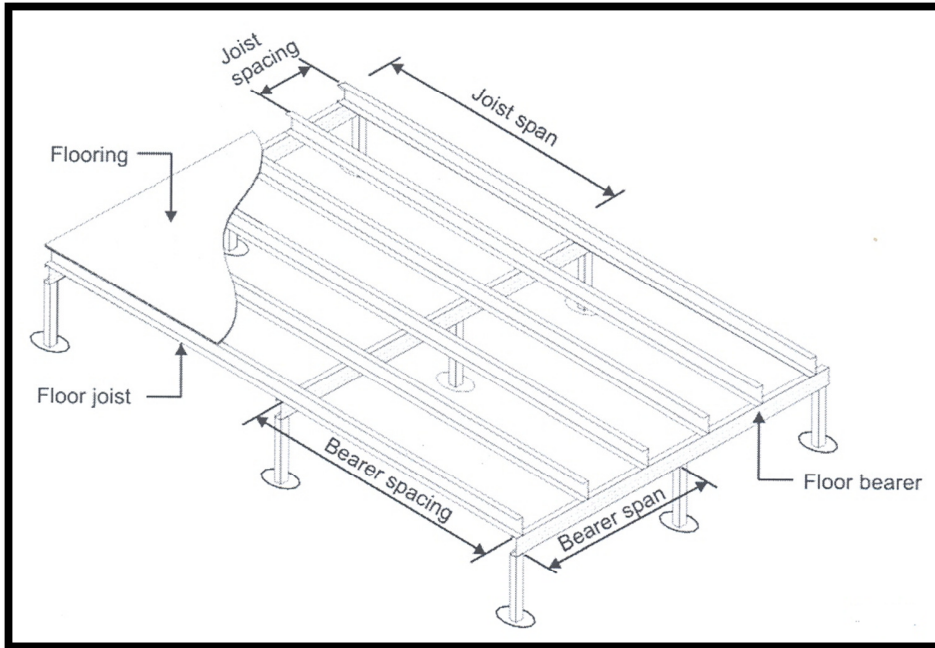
Typical layout of bearers in a LSF (SASFA, 2010)
